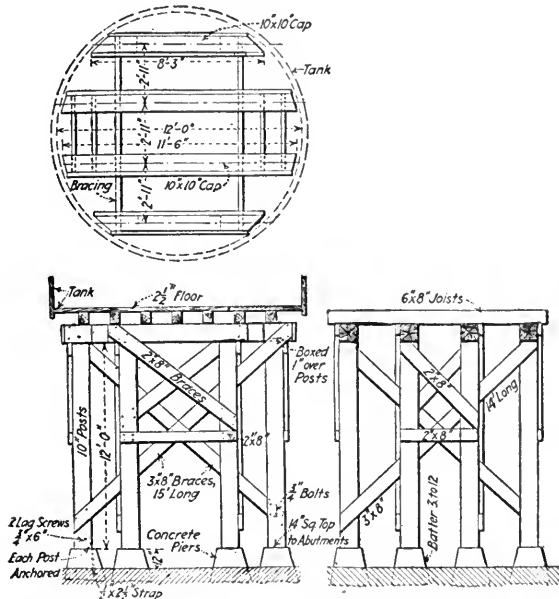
POSTS, STRINGERS AND BRACING TO CARRY WOODEN TANK.
